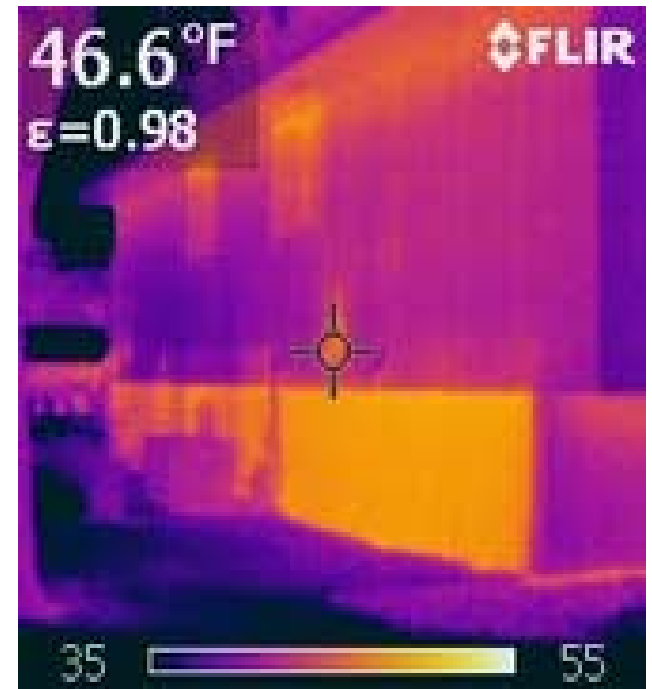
Concrete Masonry Basement Wall with Exterior Insulation
